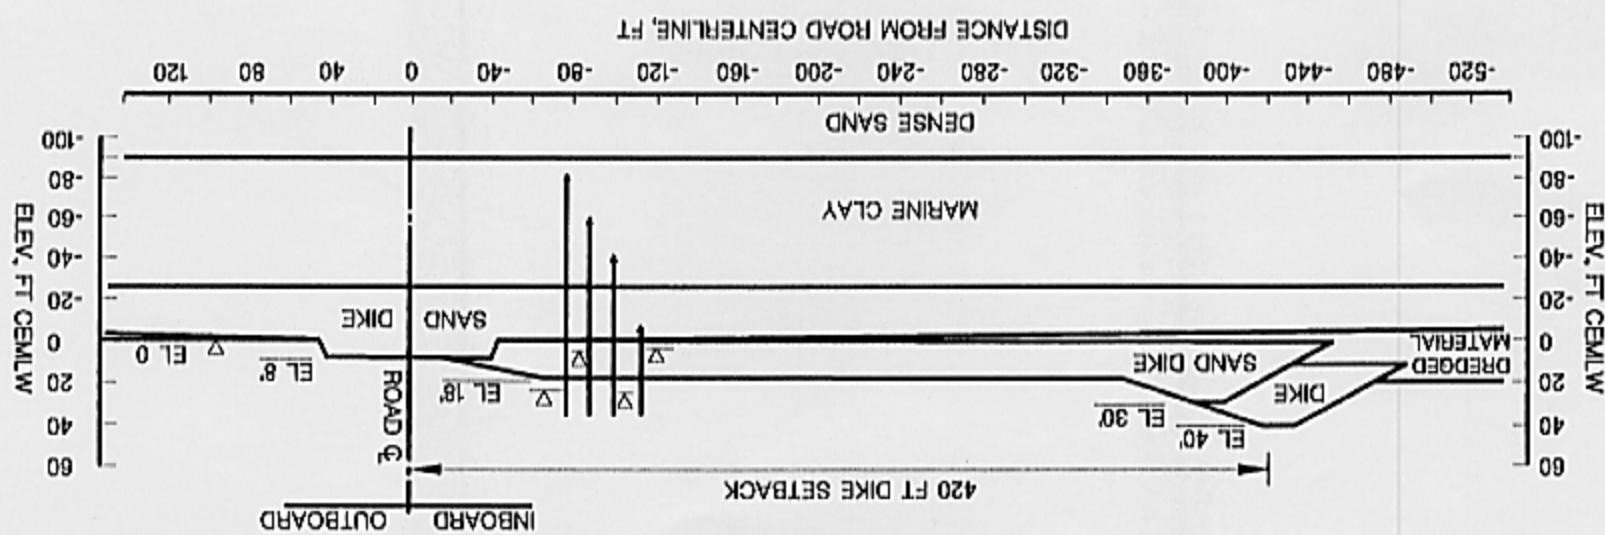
Generalized Cross-Section, Northwest Corner Perimeter Dike
